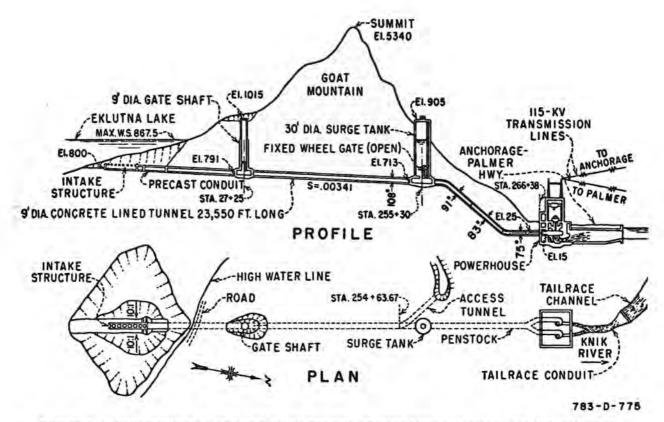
Schematic plan and profile of Eklutna project features before 1964 earthquake.
